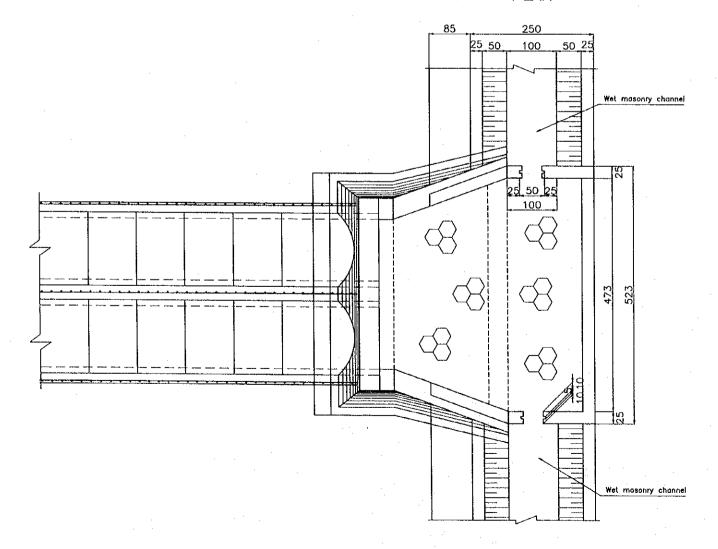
DETAIL OF PIPE CULVERT INLET (TYPE A) AT STA. 9+383.5
